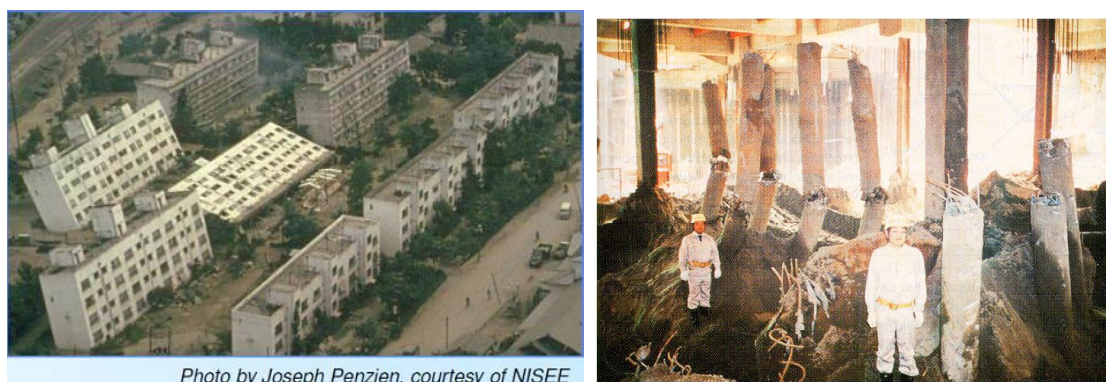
Significant building damage and collapse due to ground failure: a) Niigata 1964; b) Pile shear failure, observed in an excavation 20 years after the 1964 earthquake (image from Yoshida and Hamada, 1990).
